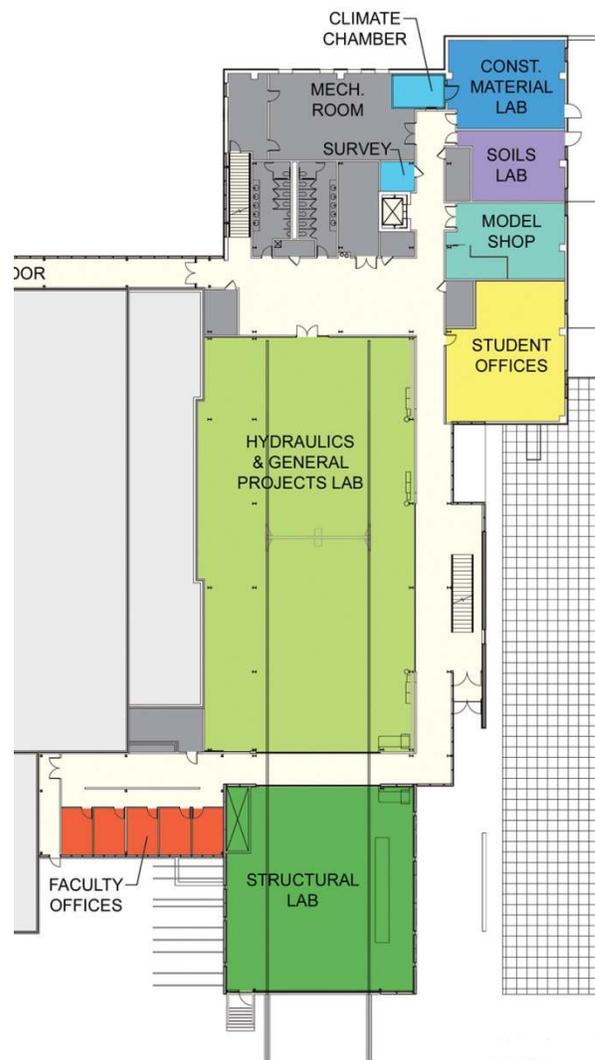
1<sup>st</sup> Story Floor Plan of Swenson Civil Engineering Building
